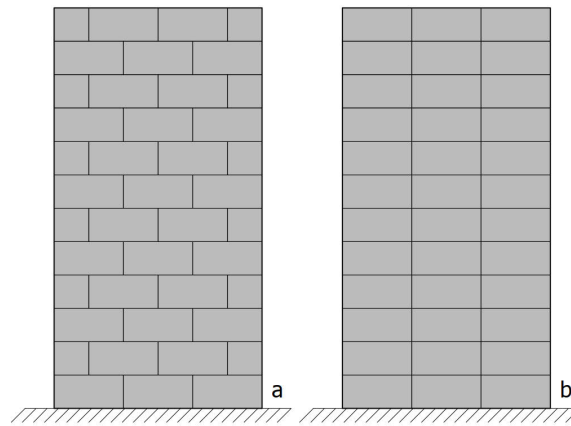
Cantilever shear wall structures; Element lay-outs with (a) and without (b) interlocking precast concrete wall elements
